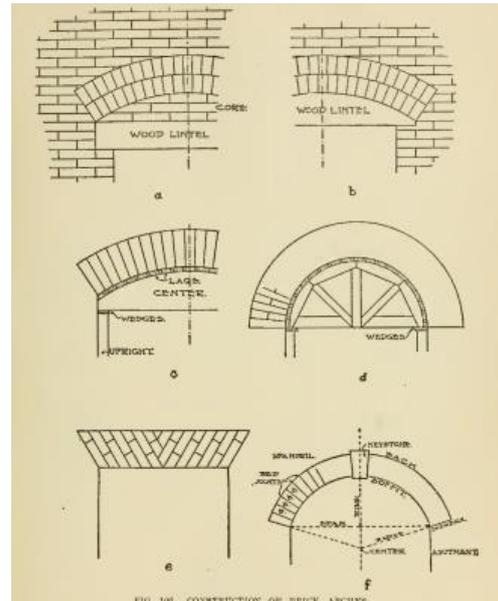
CONSTRUCTION OF BRICK ARCHES.
